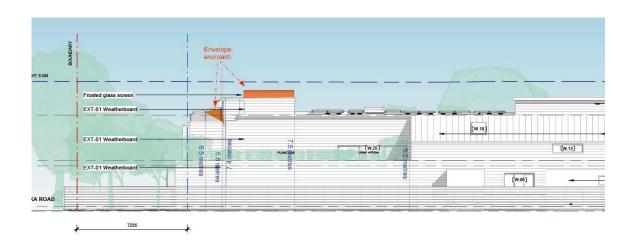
Working Drawing - showing the southern elevation of the proposal, with Iluka Road existing to the left-hand side. The portions in red are outside of the envelope. The blue dashed line indicates the 8.5m height control
